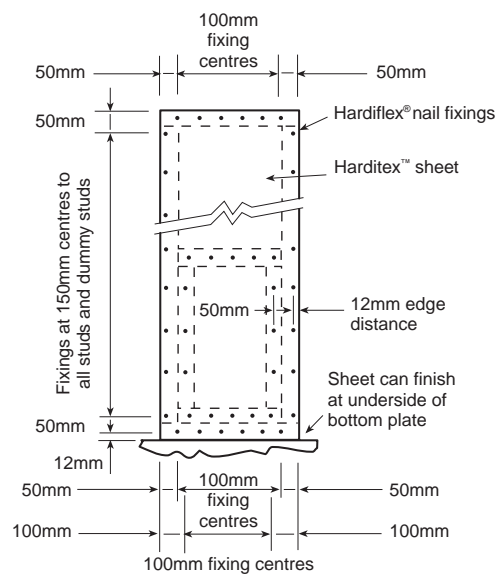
600MM-WIDE HARDITEXTM TO CONCRETE FLOOR (System HT10)
